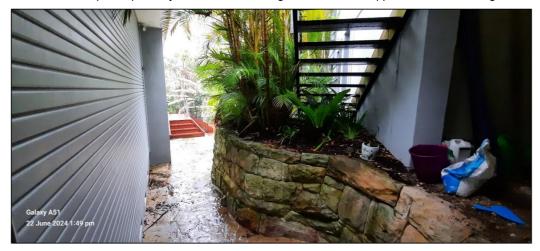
Stone paved pathway and stairway/stone wall along southern side of upper floor level, looking east.
